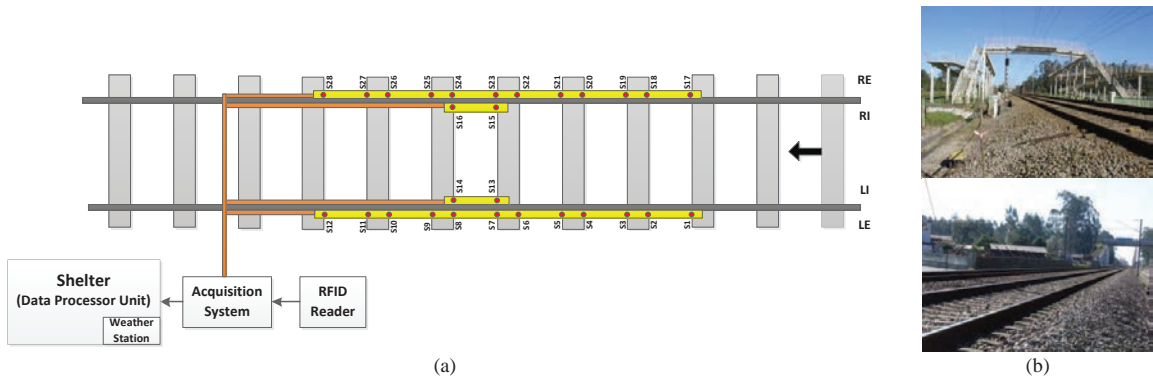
Wayside system: (a) installation scheme; (b) location of Estarreja test site.
